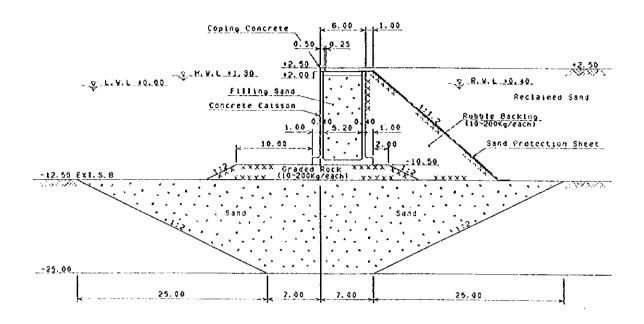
(1) Typical Cross Section of Revetment 1 (RC Caisson)
